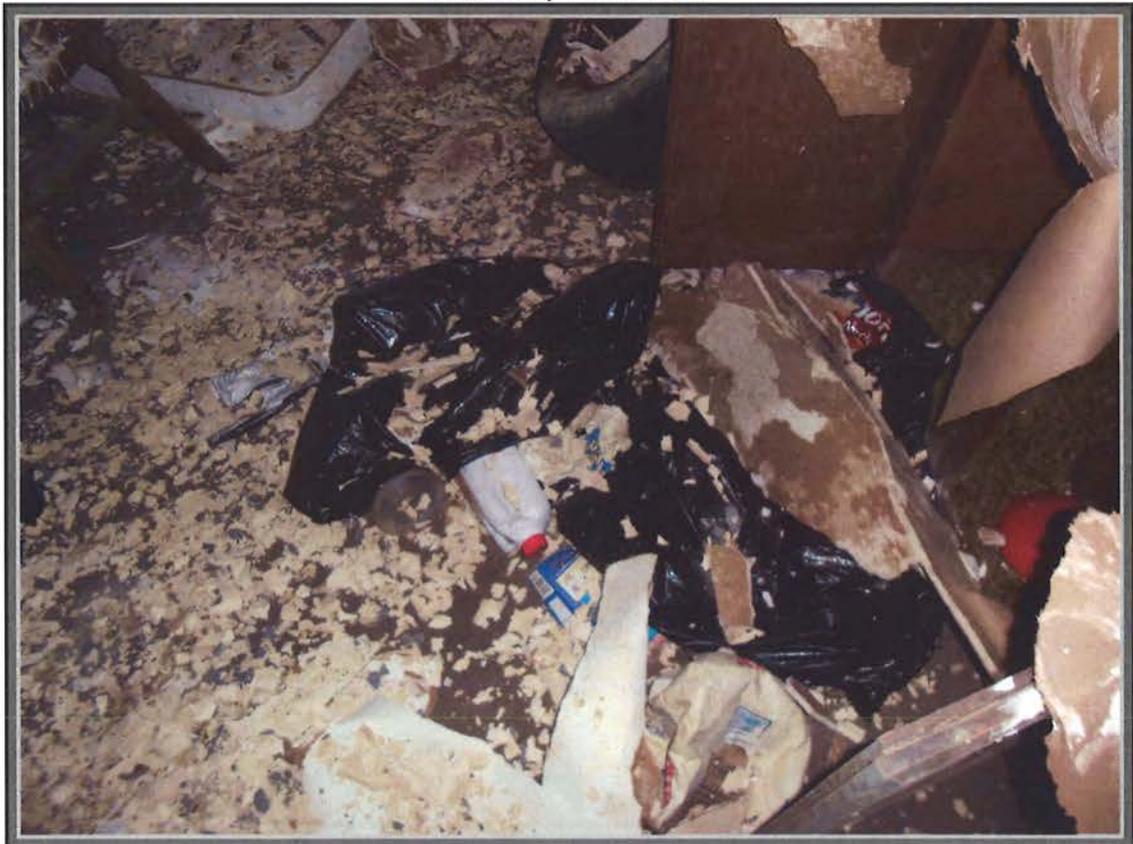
shows the damaged drywall leavening openings for the accelerated spread of fire..
